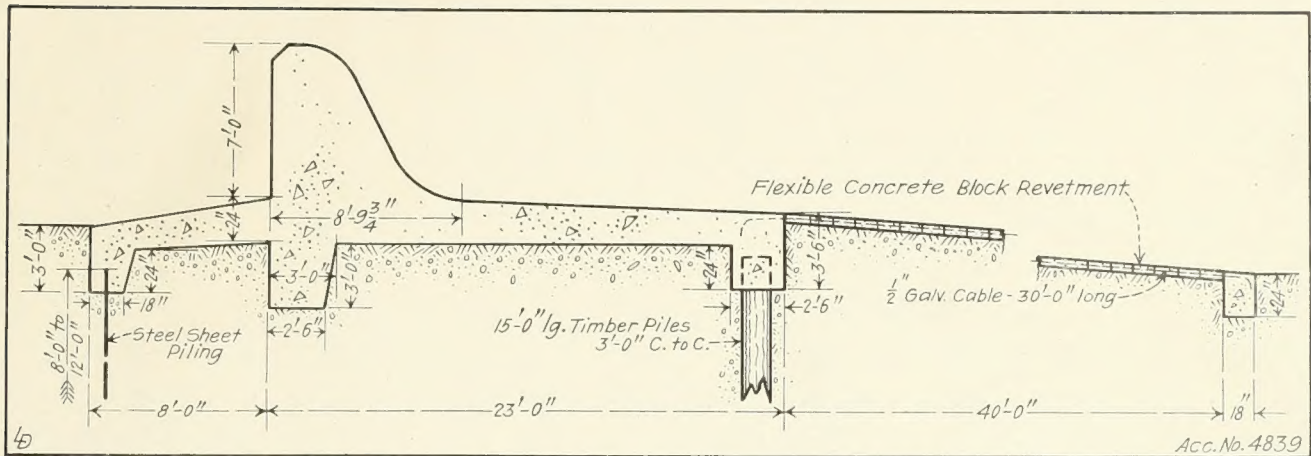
CROSS-SECTION OF THE BARRIER DAM AT HAMILTON.
